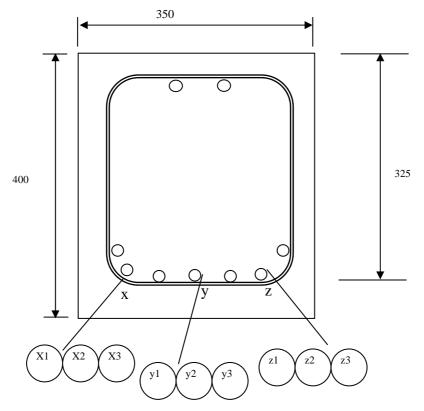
Specimen configuration and measurement points of temperature at the rebars
